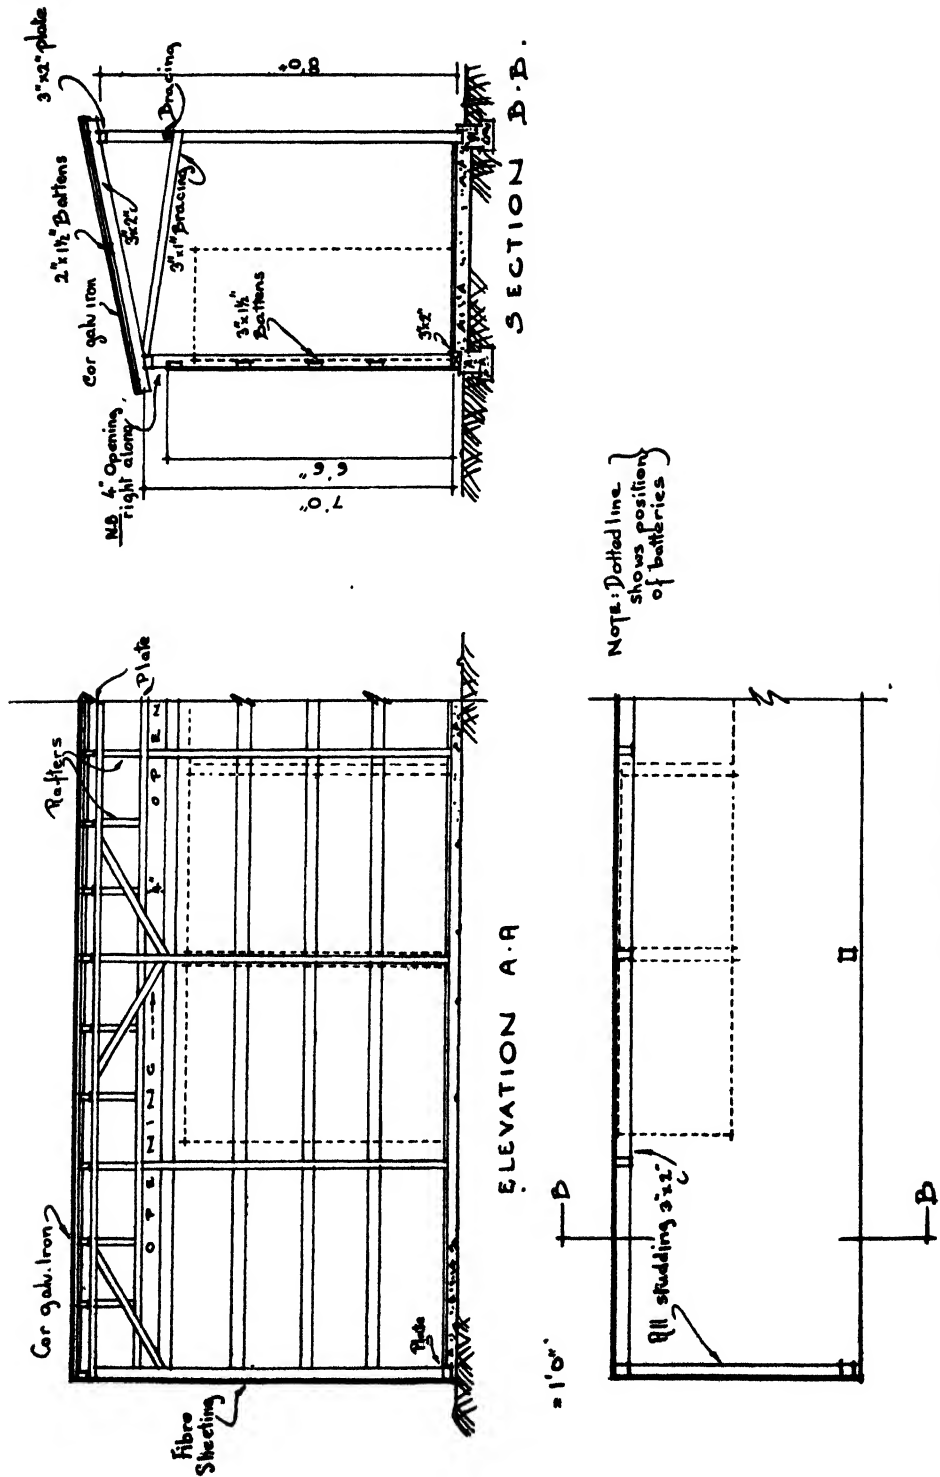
Plan and Cross Section of Battery Holding Unit.
